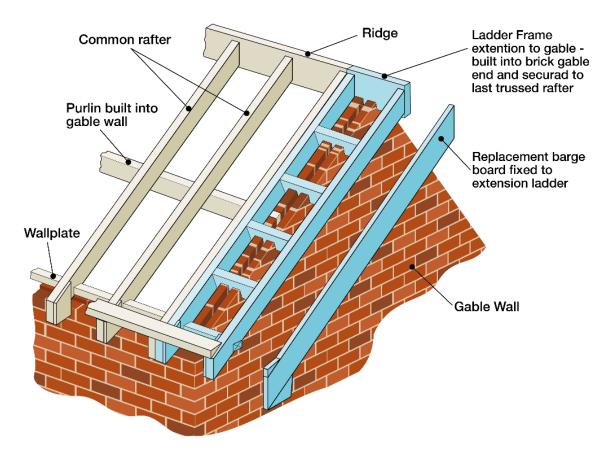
Example of Gable End Roofline Extension Using a Ladder Frame
